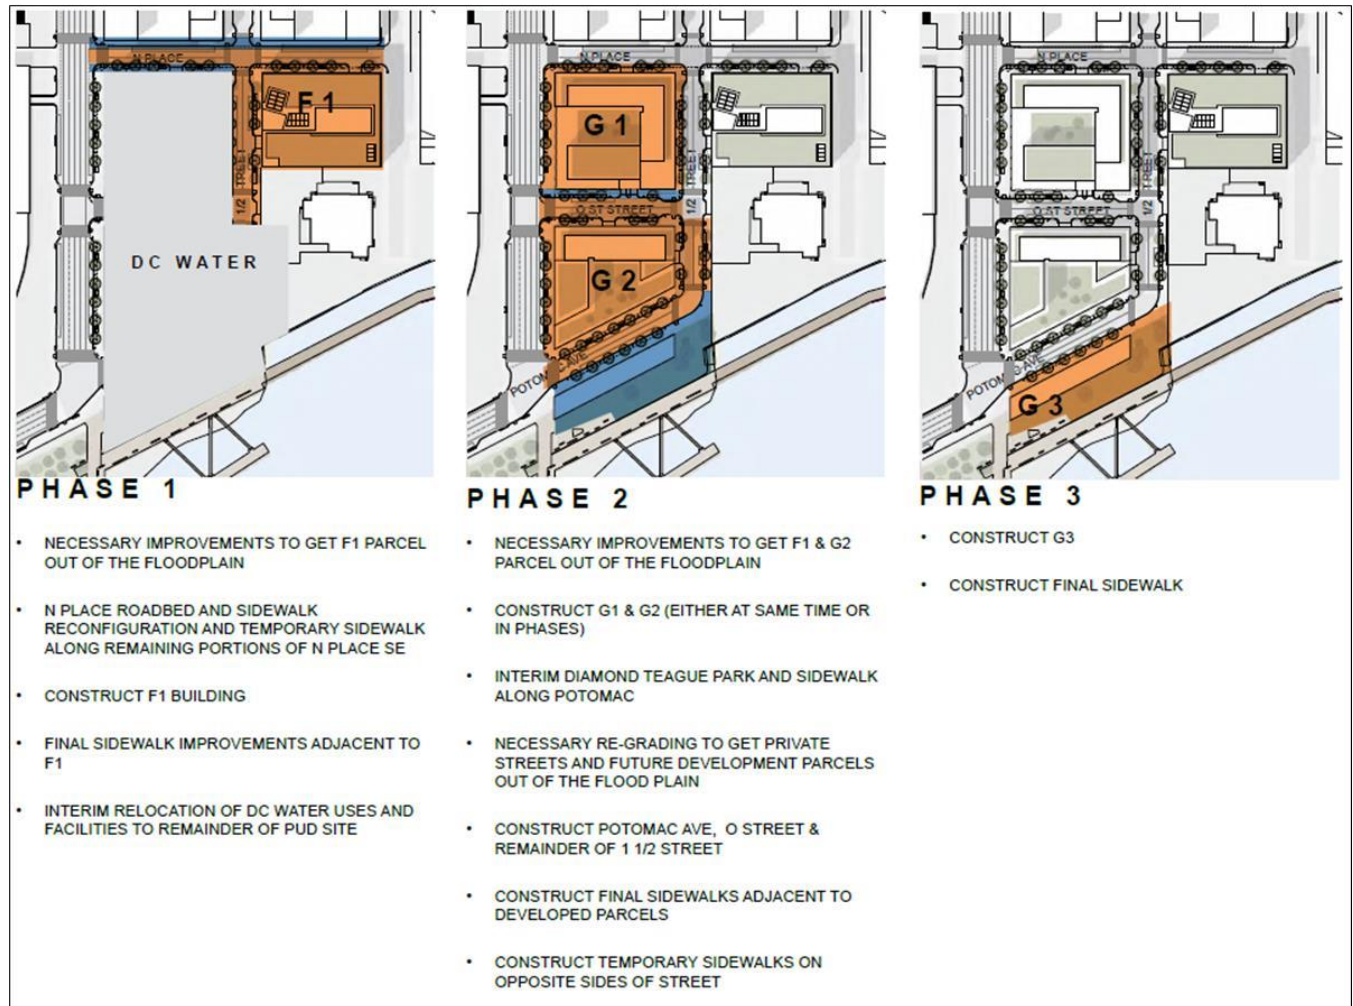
As such, when Parcel F1 is developed as the PUD’s first phase, access to the site will be limited to that parcel’s curb cut from N Place as well as the construction of the northern half of 1½ Street, through the proposed O Street intersection. Vehicles will enter the Parcel F1 parking garage from 1½ Street and will exit on to N Place. Canal Street north of N Place is a public street, but is currently closed to traffic to accommodate DC Water area improvements. It is unknown at this time whether Canal Street will be reopened north of N Place at the time that Parcel F1 is completed. Thus, this study examines conditions both with and without a reopened Canal Street.
